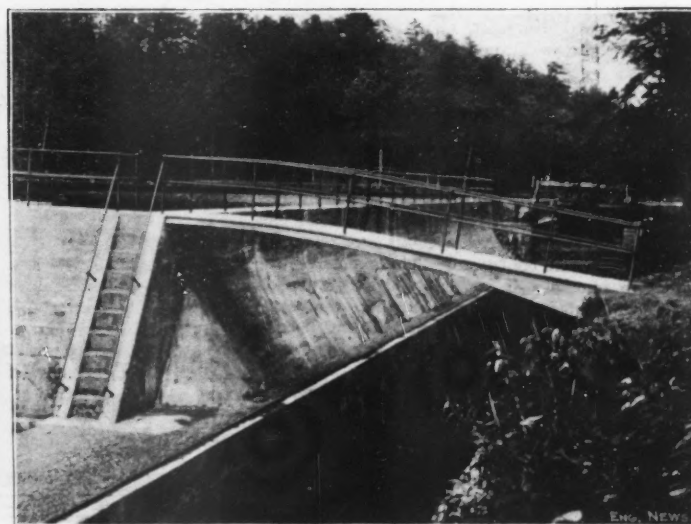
VIEW OF CANAL, WING DAM AND BRIDGE OVER CANAL.
